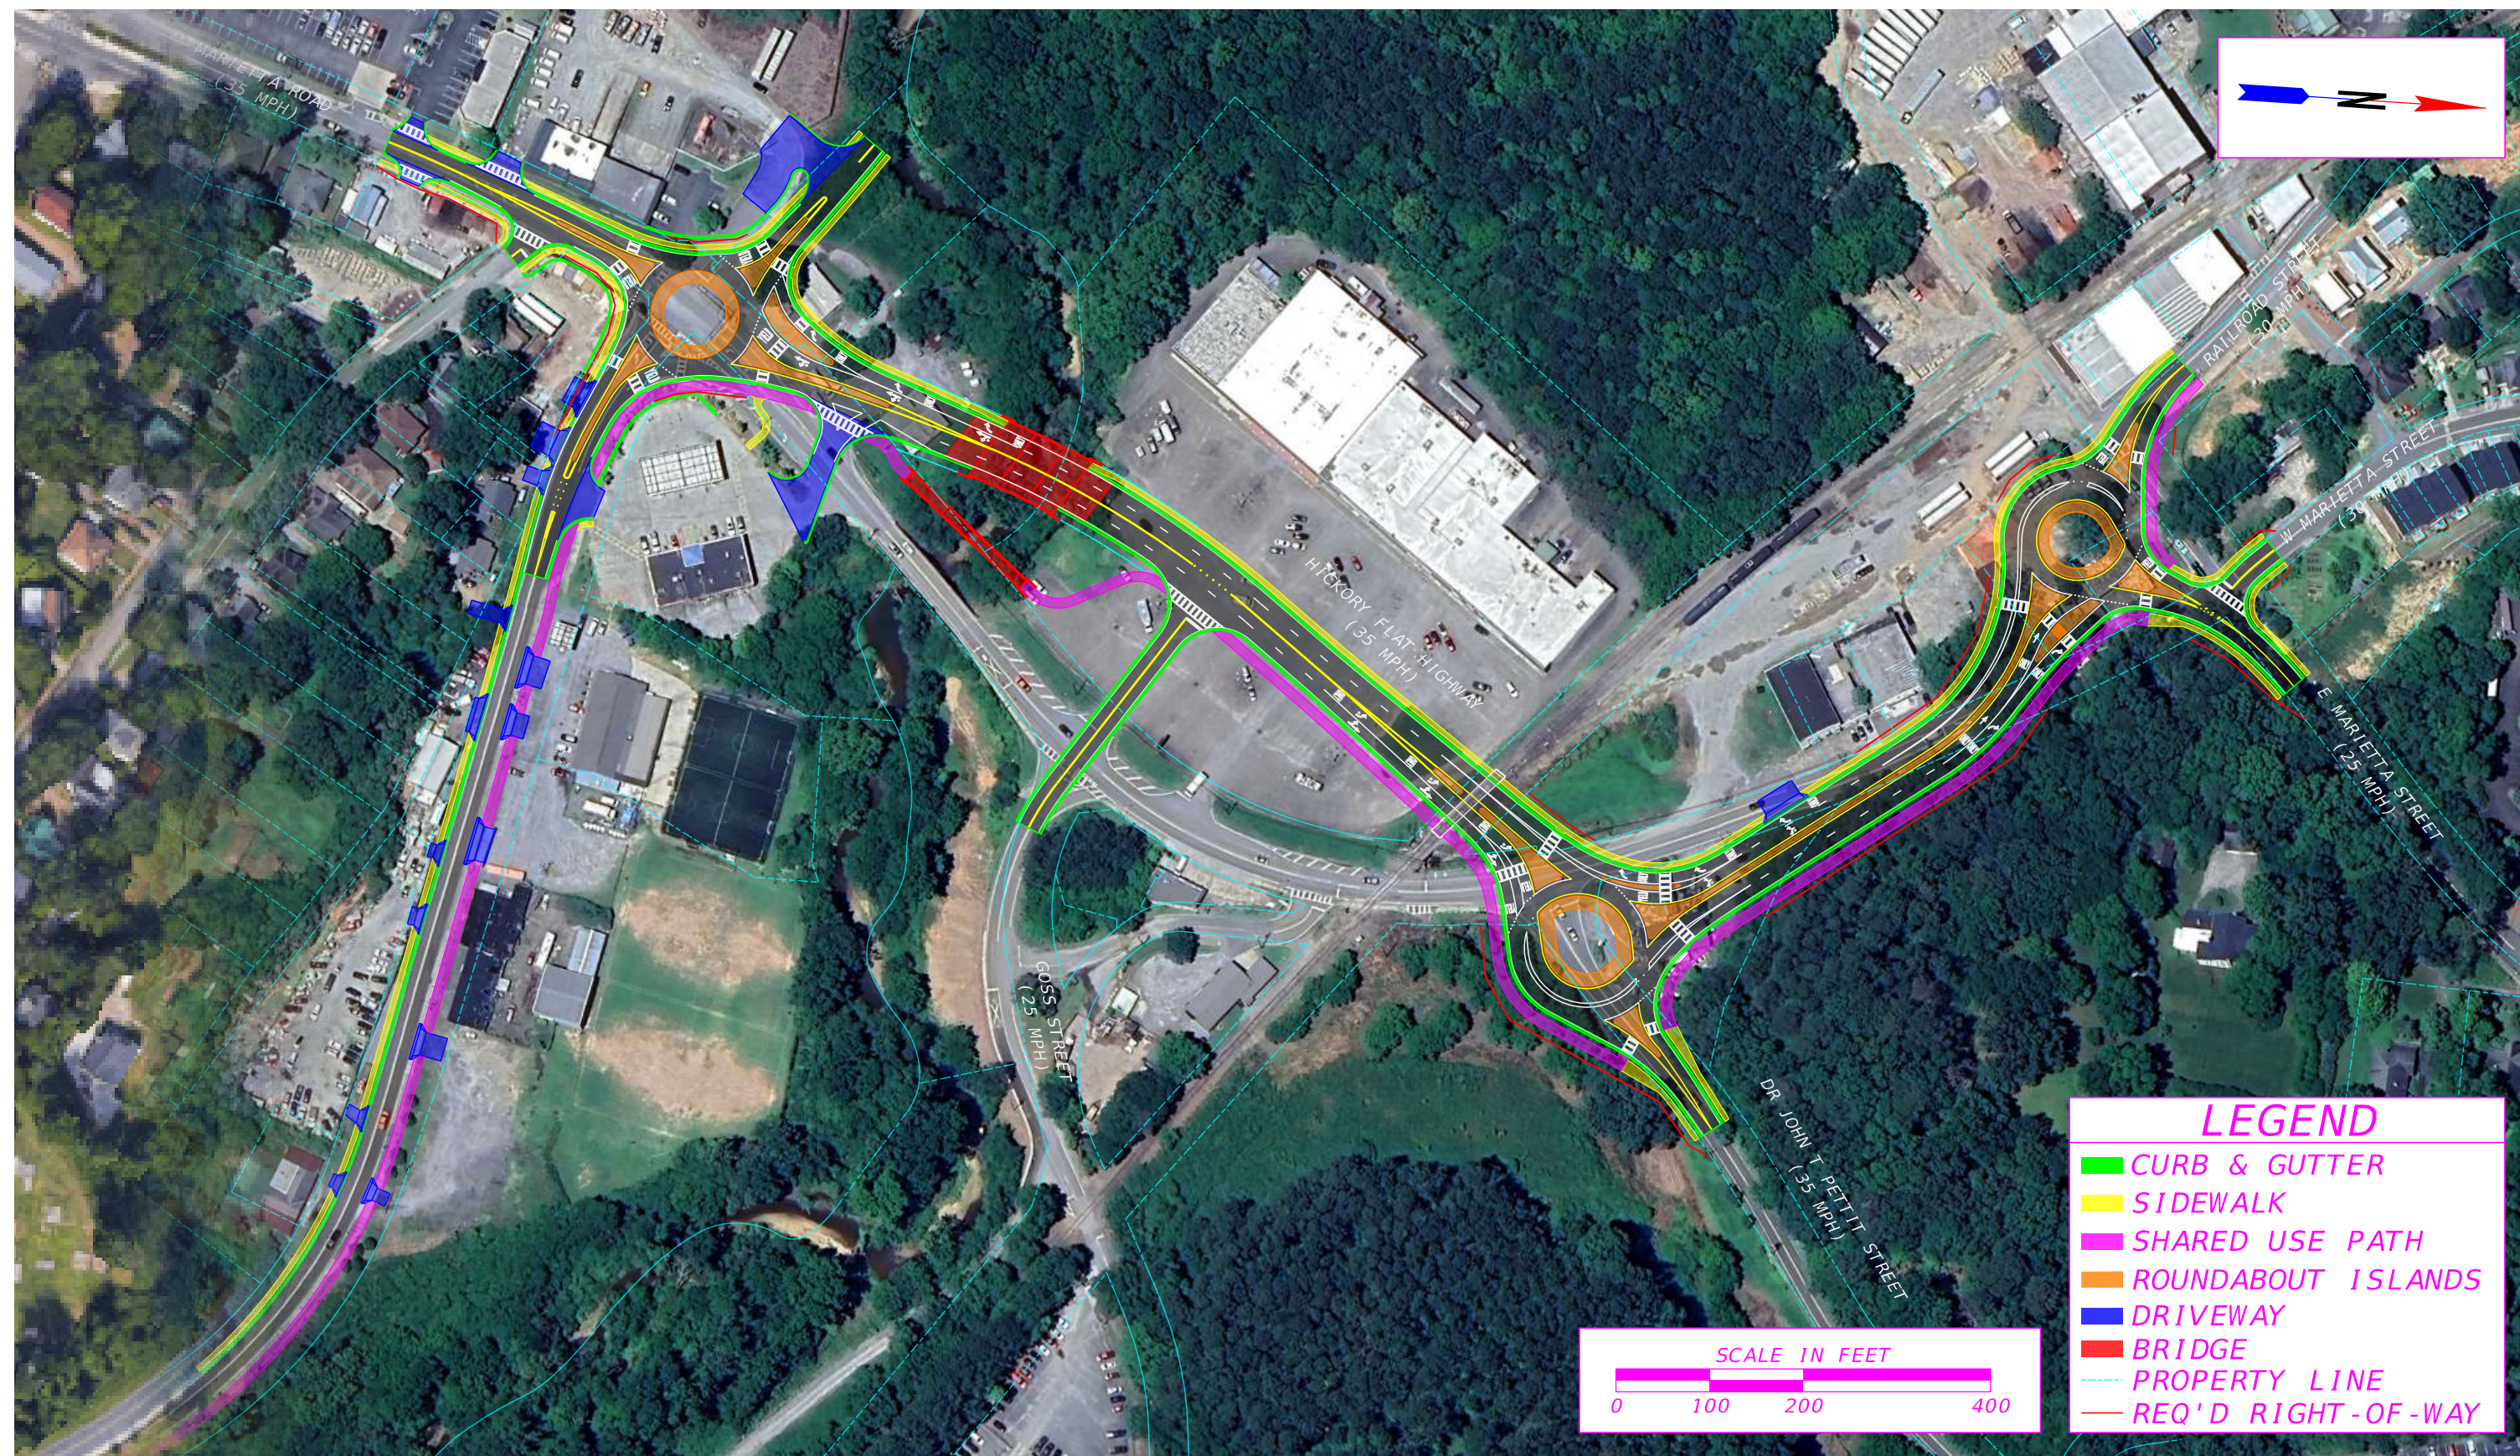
Hickory Flat Highway and Marietta Street Roadway Concept
